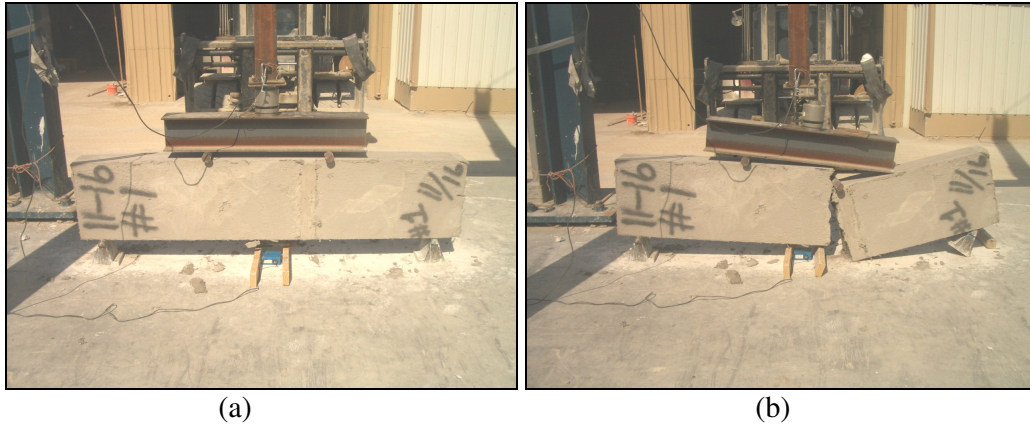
Beam for 1<sup>st</sup> batch concrete cast on 11/16/06 for 90 day test;
